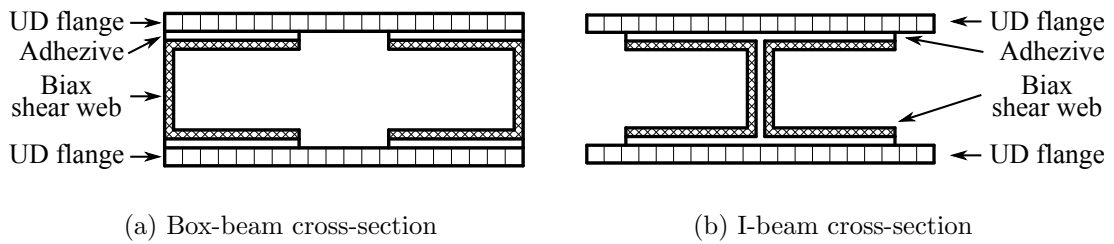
Two cross-section types of composite beam specimens. Box-shaped - a, and I-shaped - b.
